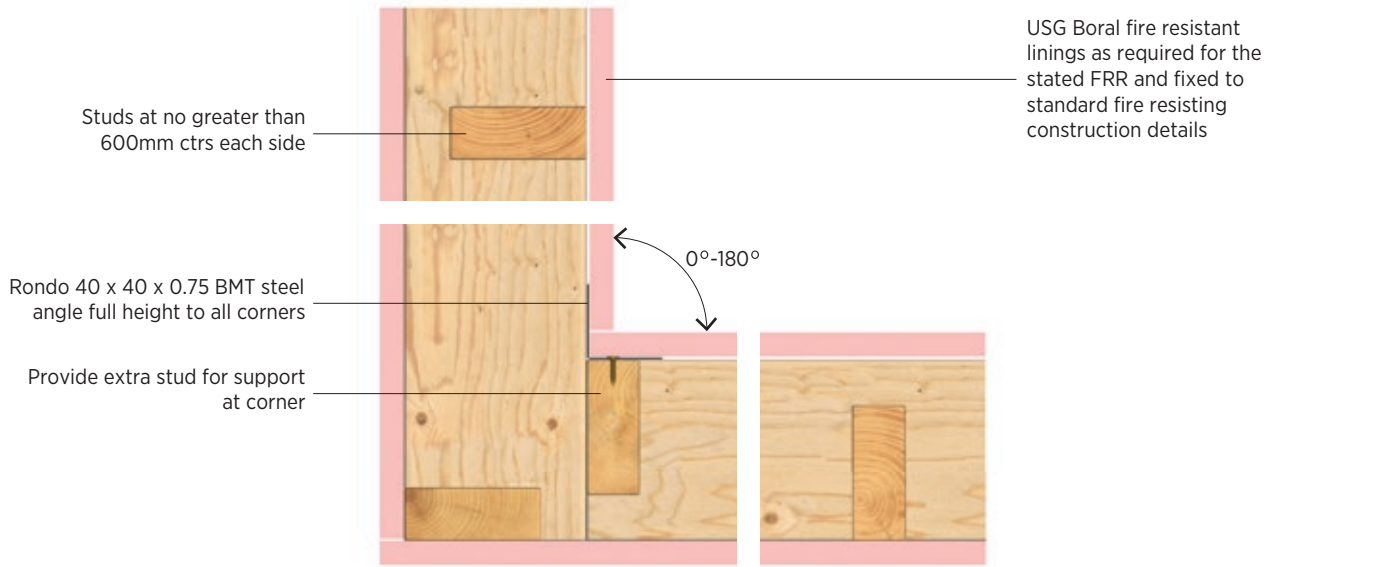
Staggered Timber Stud Wall – Corner Junction Detail
